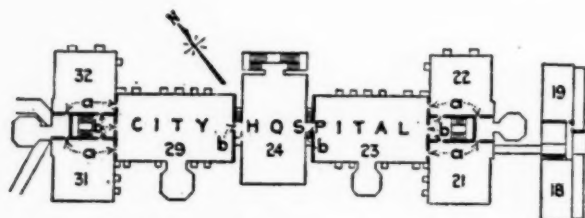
Plan of City Hospital building, showing old walls utilized as fire walls. Heavy lines indicate old walls utilized as fire walls. Letters a and b indicate type of fire doors.
